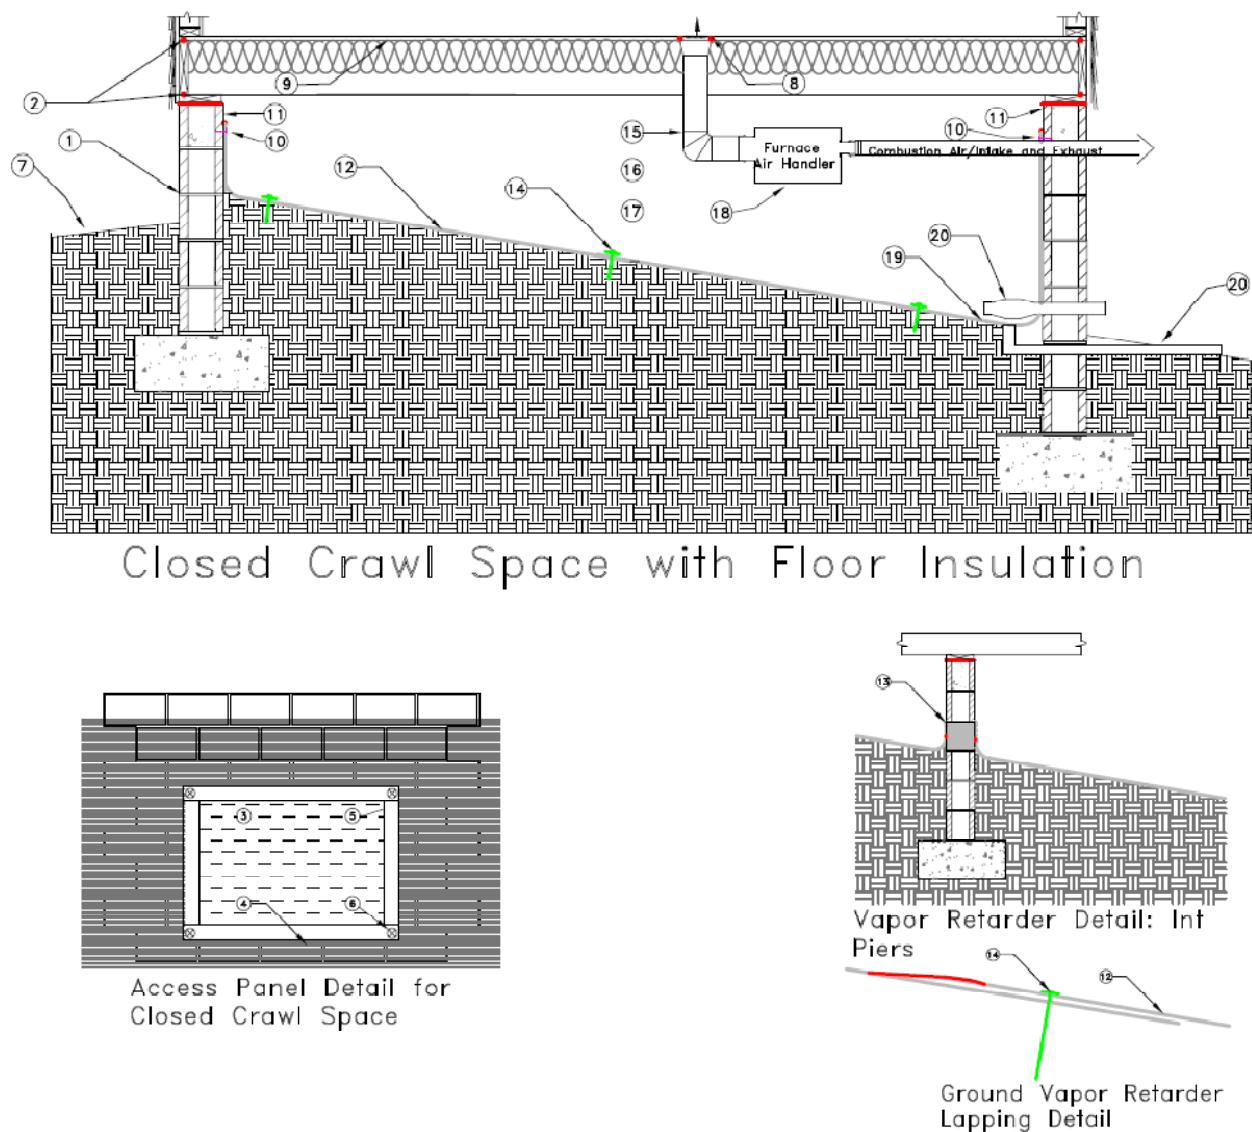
Flagstaff schematic design for floor-insulated closed crawl space.
